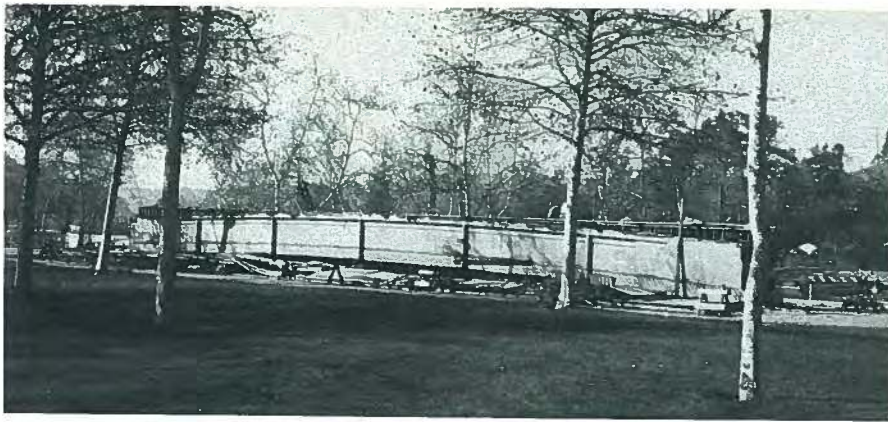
Completed girders at casting site in Arroyo Seco Park.
